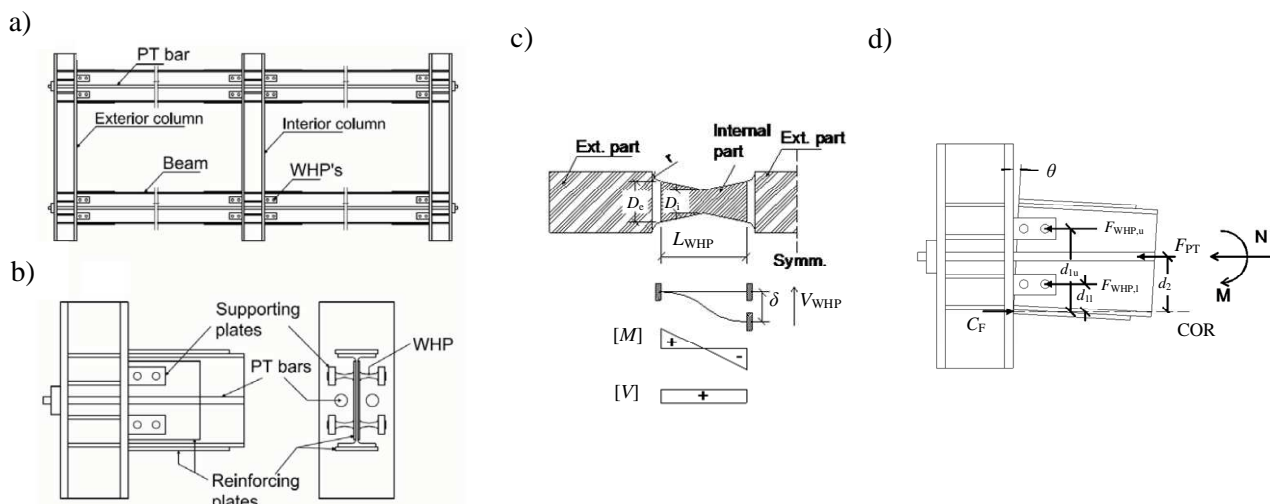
(a) SC-MRF incorporating PT connections with WHPs; (b) exterior PT connection details; (c) Geometry of half a WHP; (d) Gap opening mechanism
